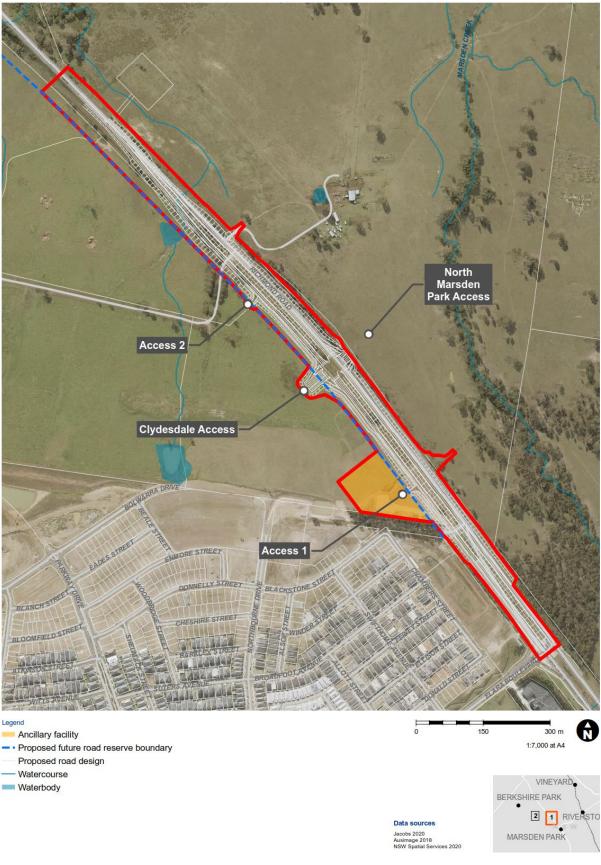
Local Context Plan – Road Corridor – Sheet 1 (Jacobs, 2020)
